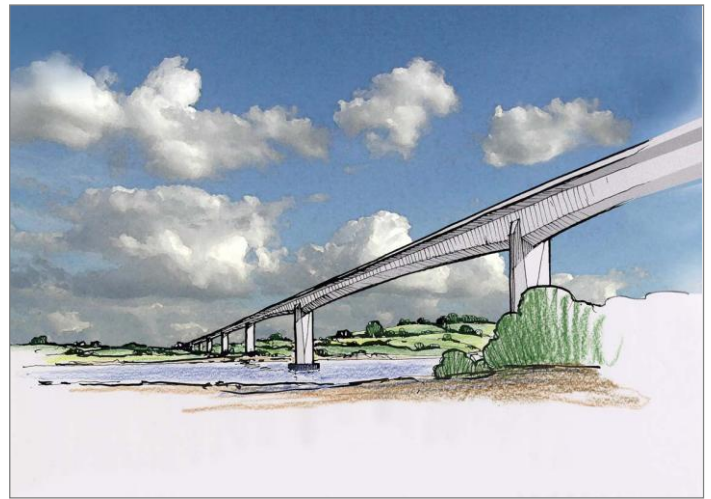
Artist's Sketch of Haunched Girder Bridge Option
